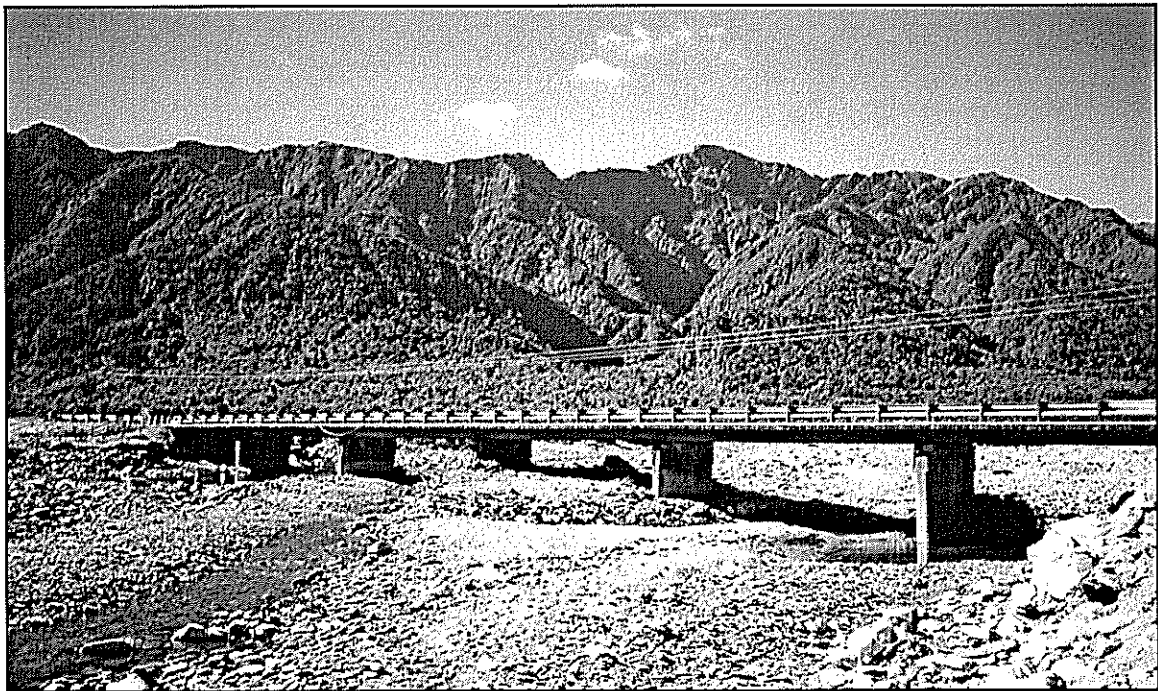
Big Wainihinihi River bridge, in Westland, South Island, New Zealand.
